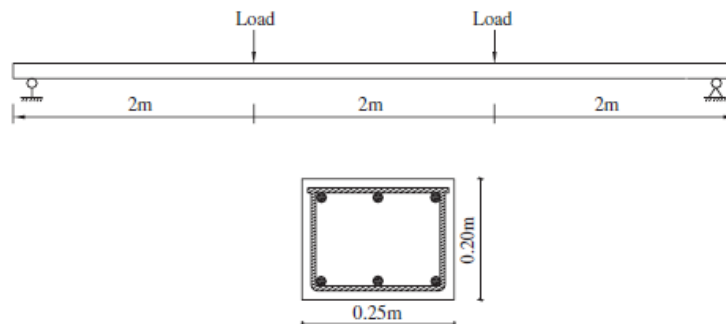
Beam cross section and with two point loading (Jaishi and Ren 2006)
